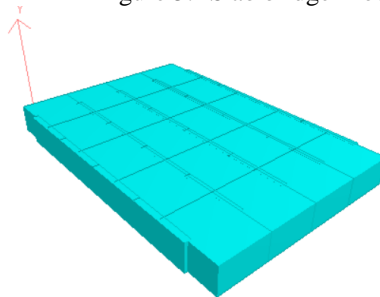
3D Rendered model of Slab Bridge in Staad Pro
